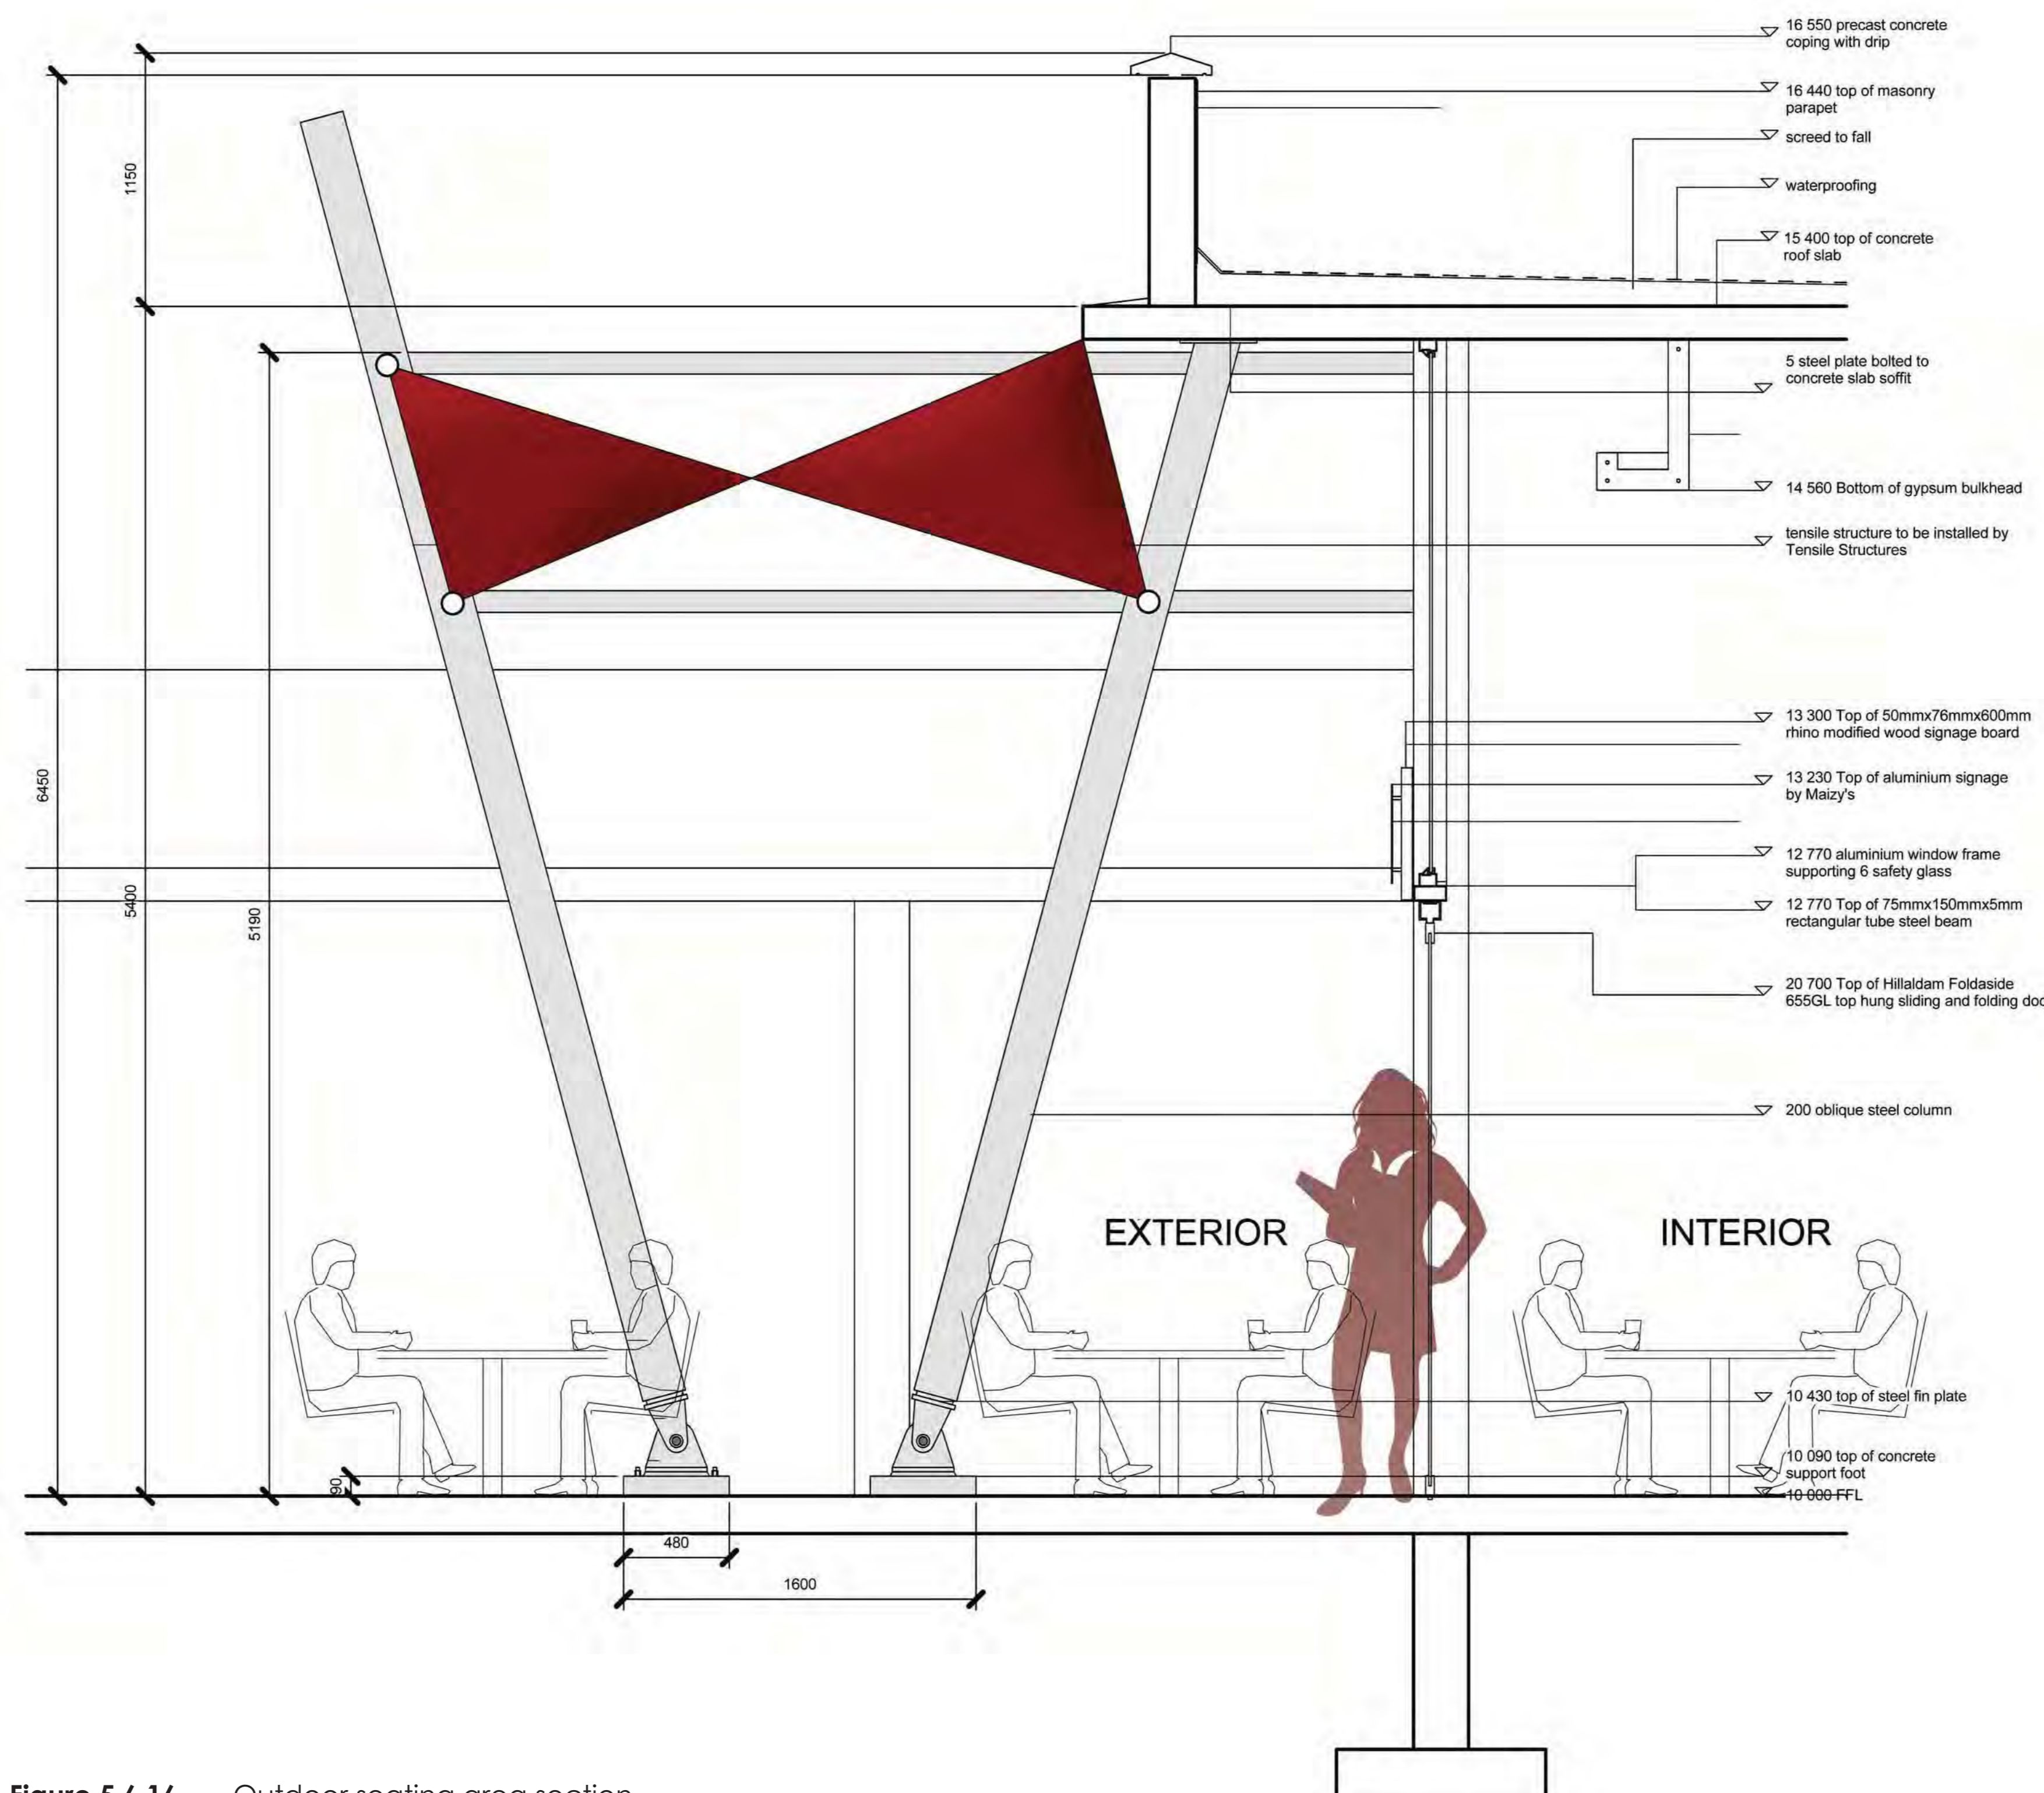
Outdoor seating area section Scale 1:20
